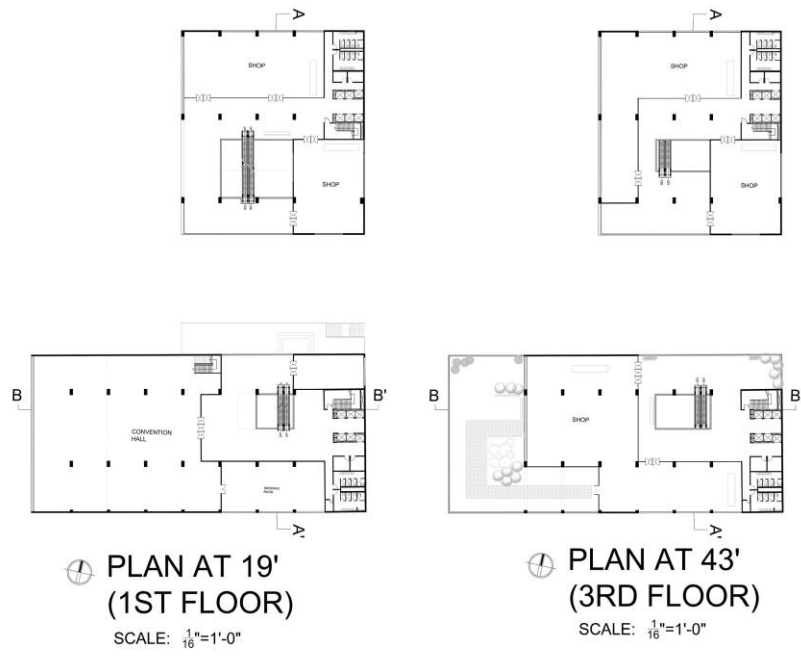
1<sup>st</sup> and 3<sup>rd</sup> floor plan
